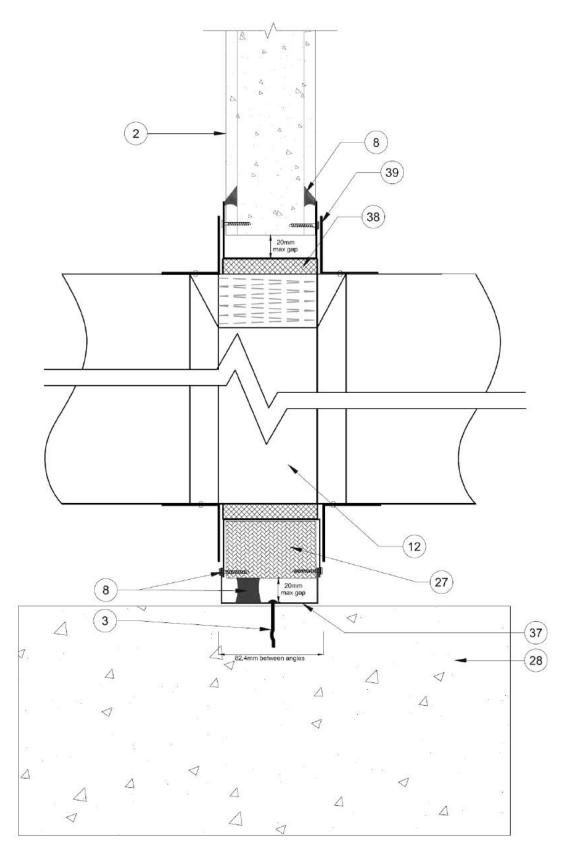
Holyoake IBD-FS and IBD Damper installation 55mm-75mm from base of wall
